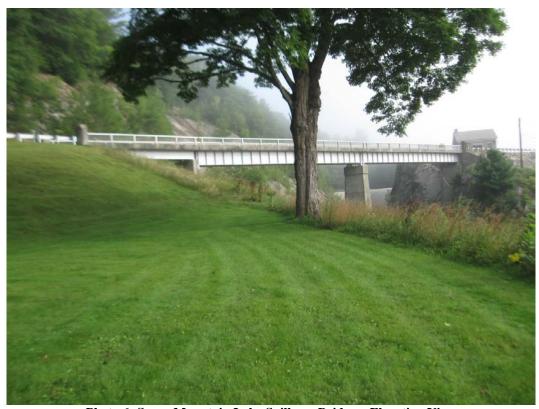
Surry Mountain Lake Spillway Bridge – Elevation View
